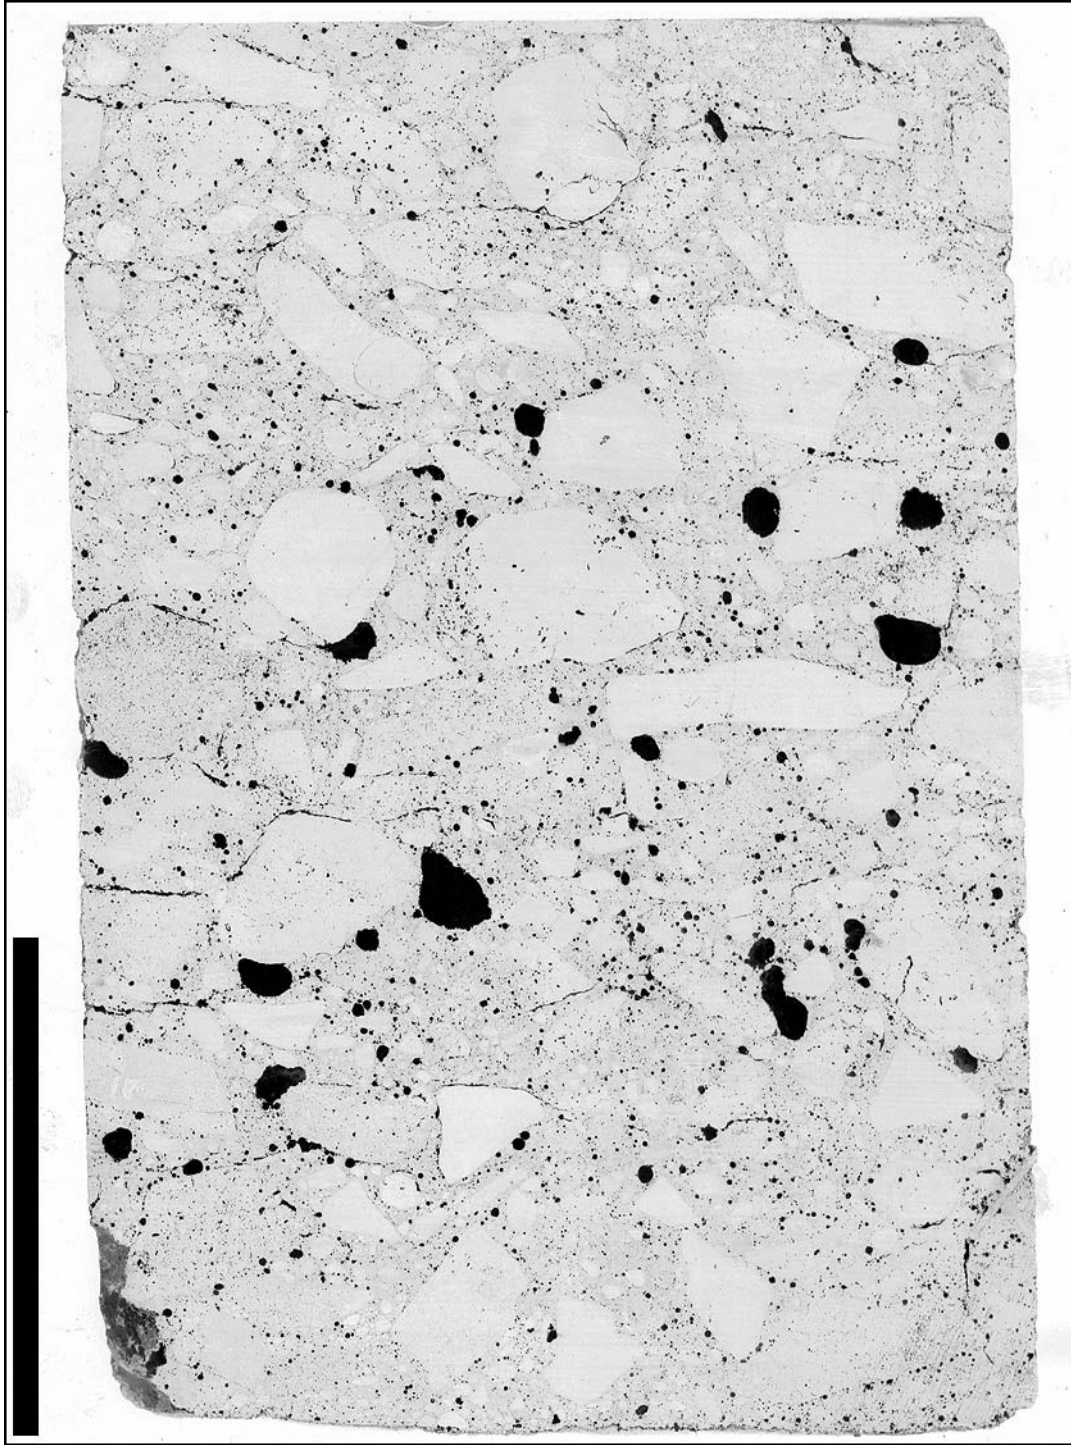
Close up of bottom half of sidewalk portion of core "1" to show cracks, scale bar 5 cm.
